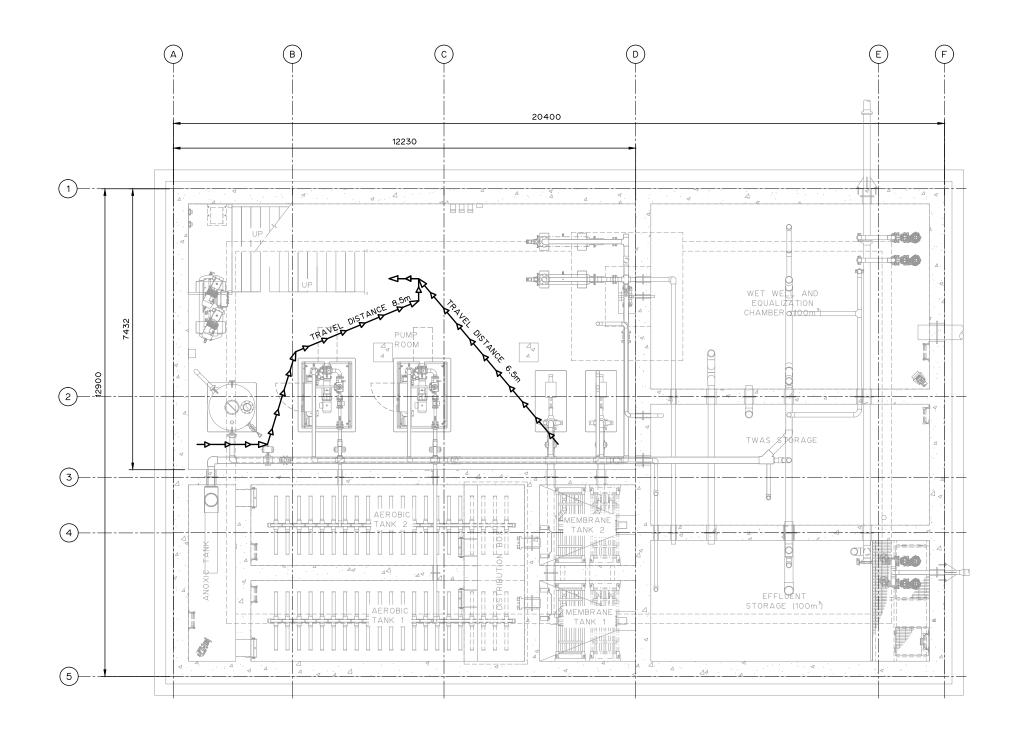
and 4.10.2 and show the building architectural layouts for the lower and upper levels.
